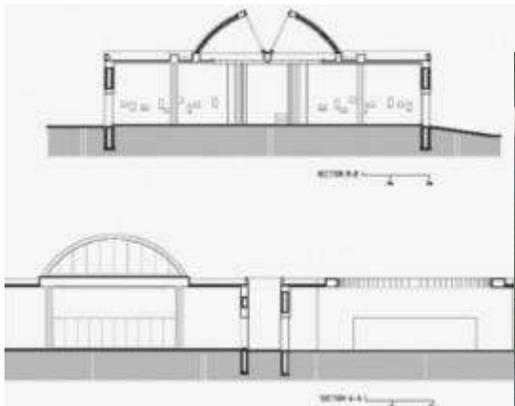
Sections Figure 24 Interior view of prayer hall and qibla wall
